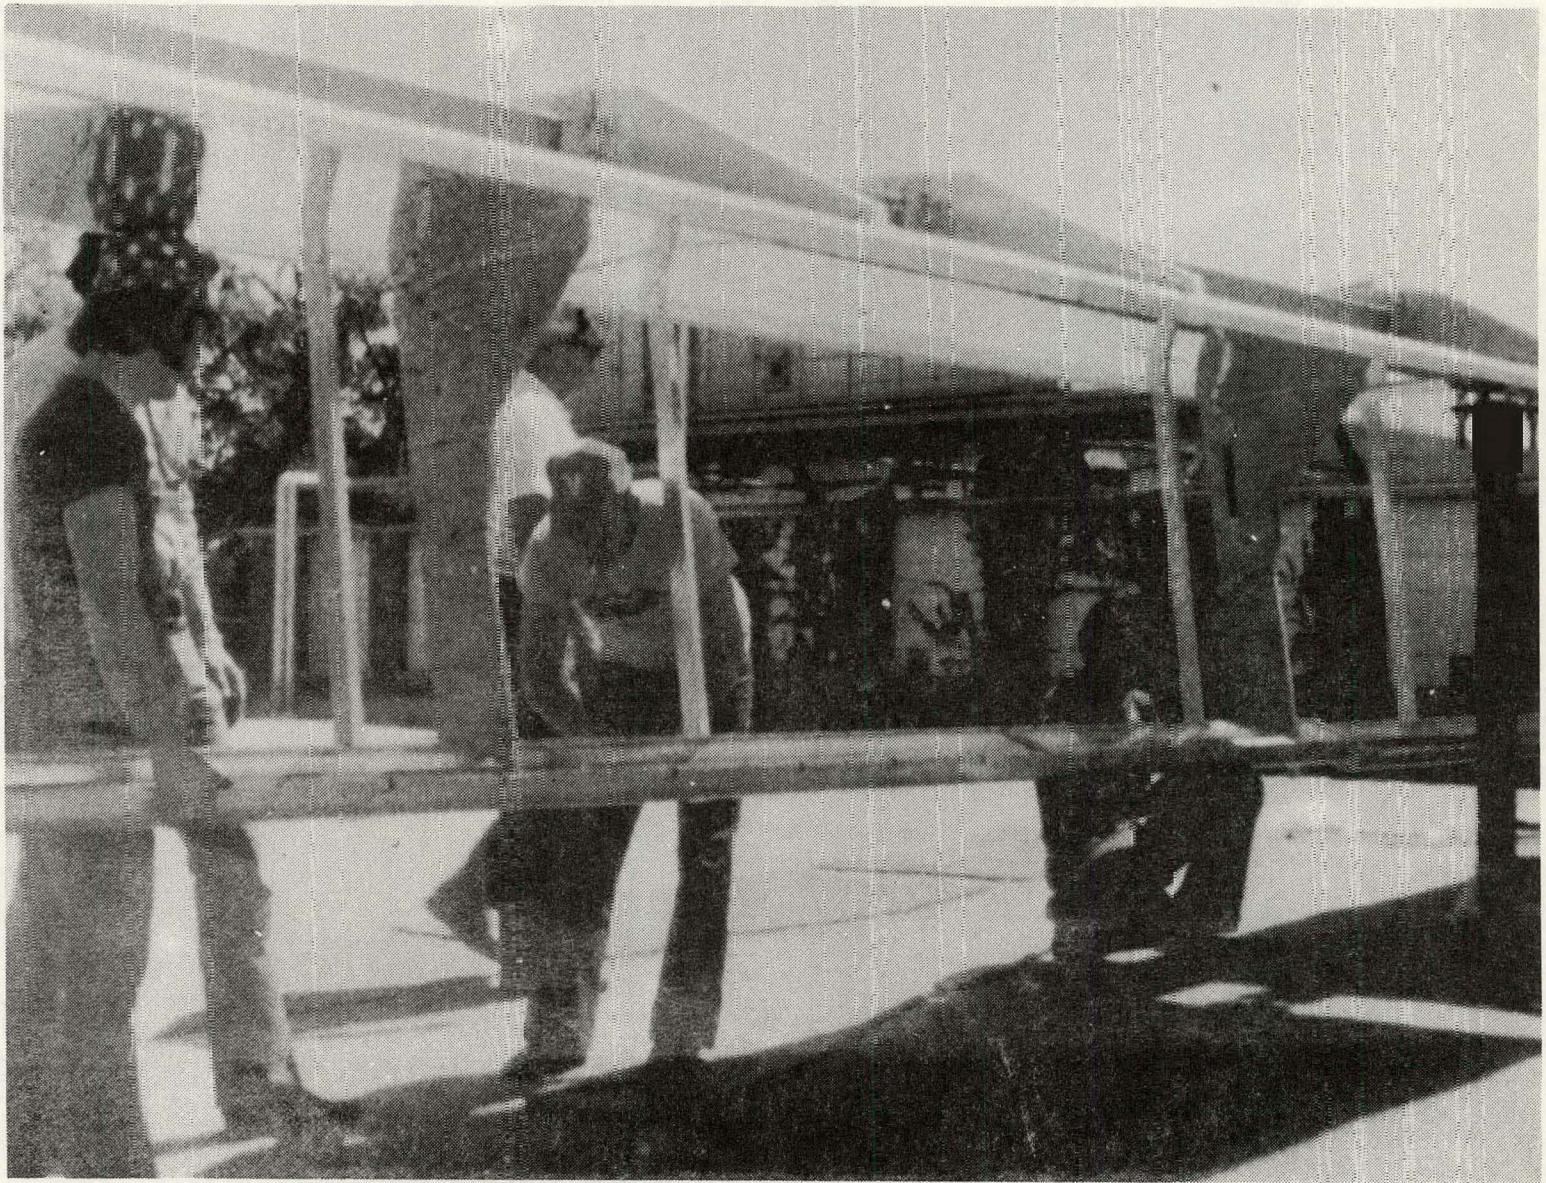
Installation of Receiver Using Template for Location, April 1978
